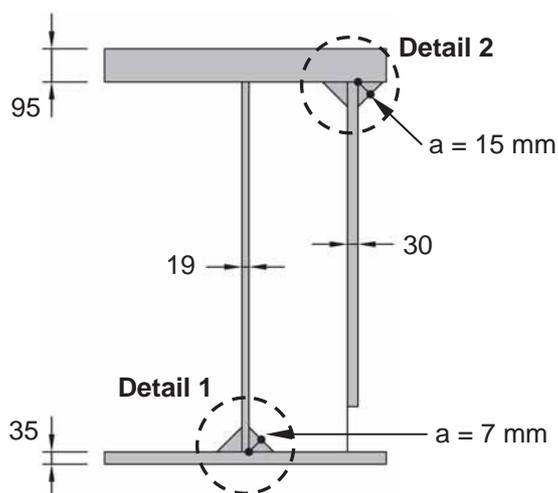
Two welding details of a twin-girder bridge. Dimensions in [mm].
